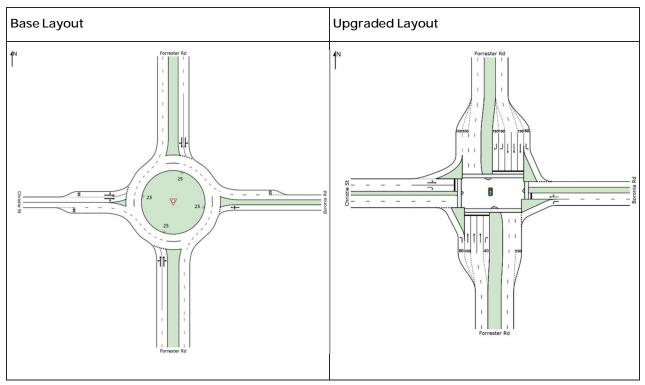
2031 with Links Road extension - Forrester Road/Christies Street/Boronia Road
